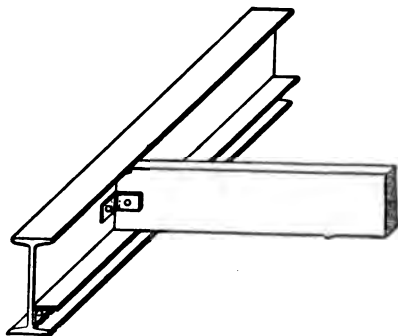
Wooden Beam Framed to I Beam with Shelf-angle
